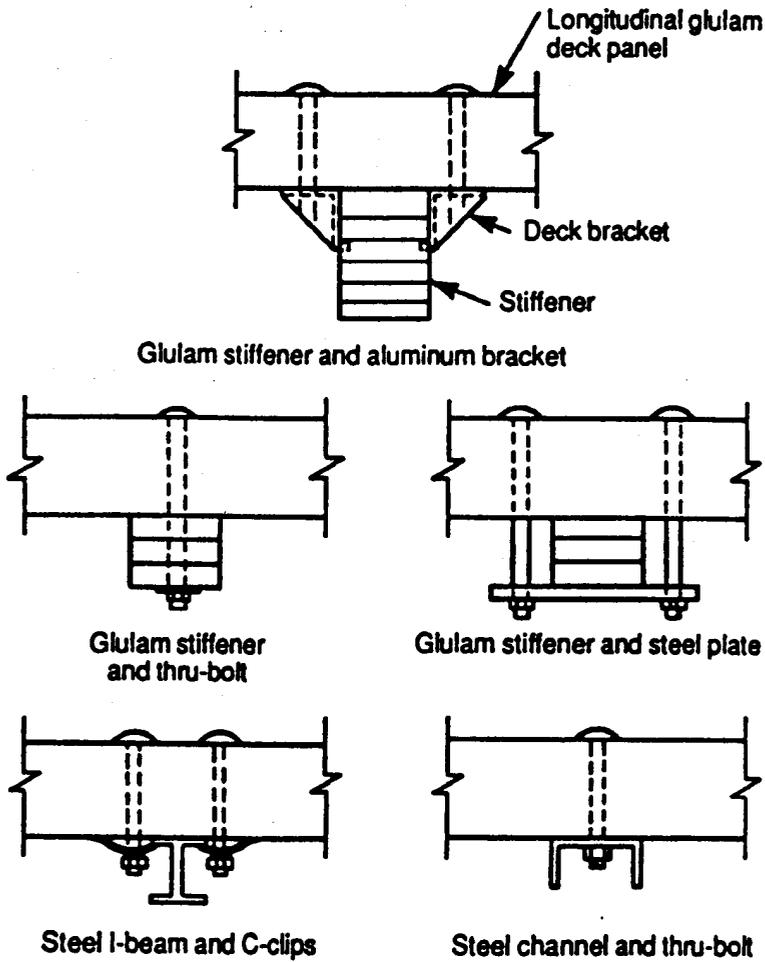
Types of transverse stiffener-beam configurations for longitudinal glulam deck panels.
